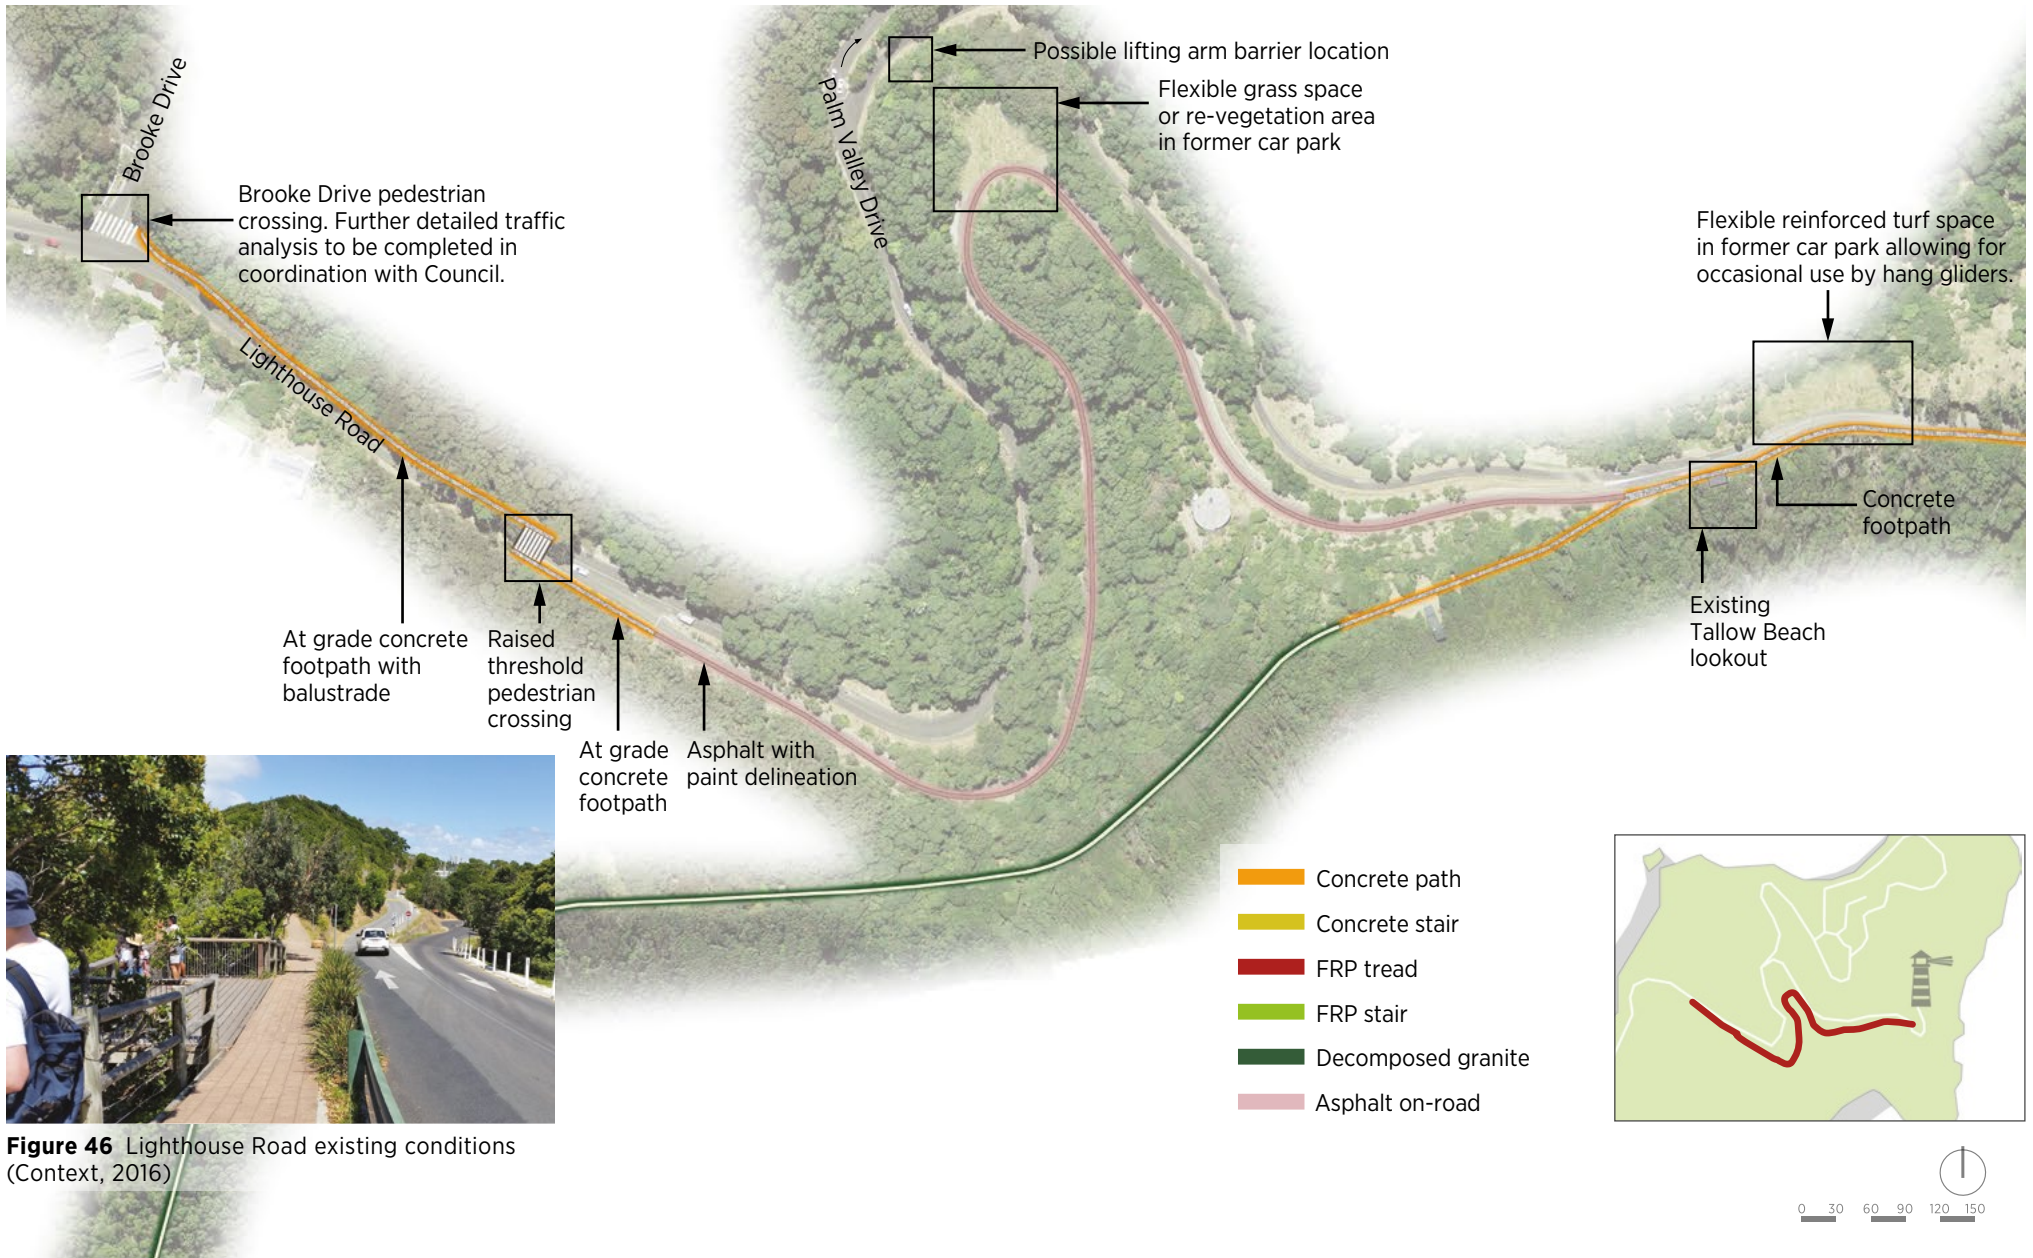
Lighthouse Road existing conditions (Context, 2016)
